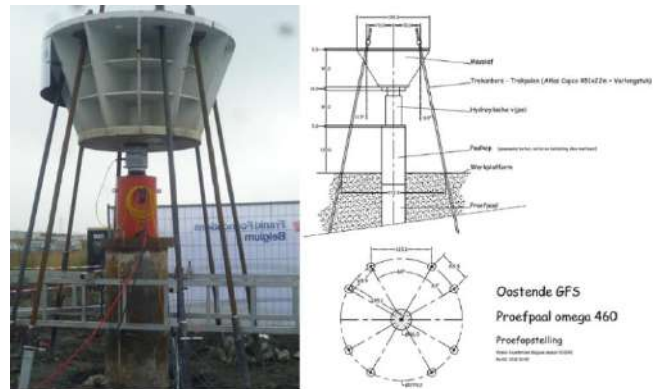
Test pile loading system, with 8 deep anchors inclined at 12°, each enabling a 500 kN tensile force.
